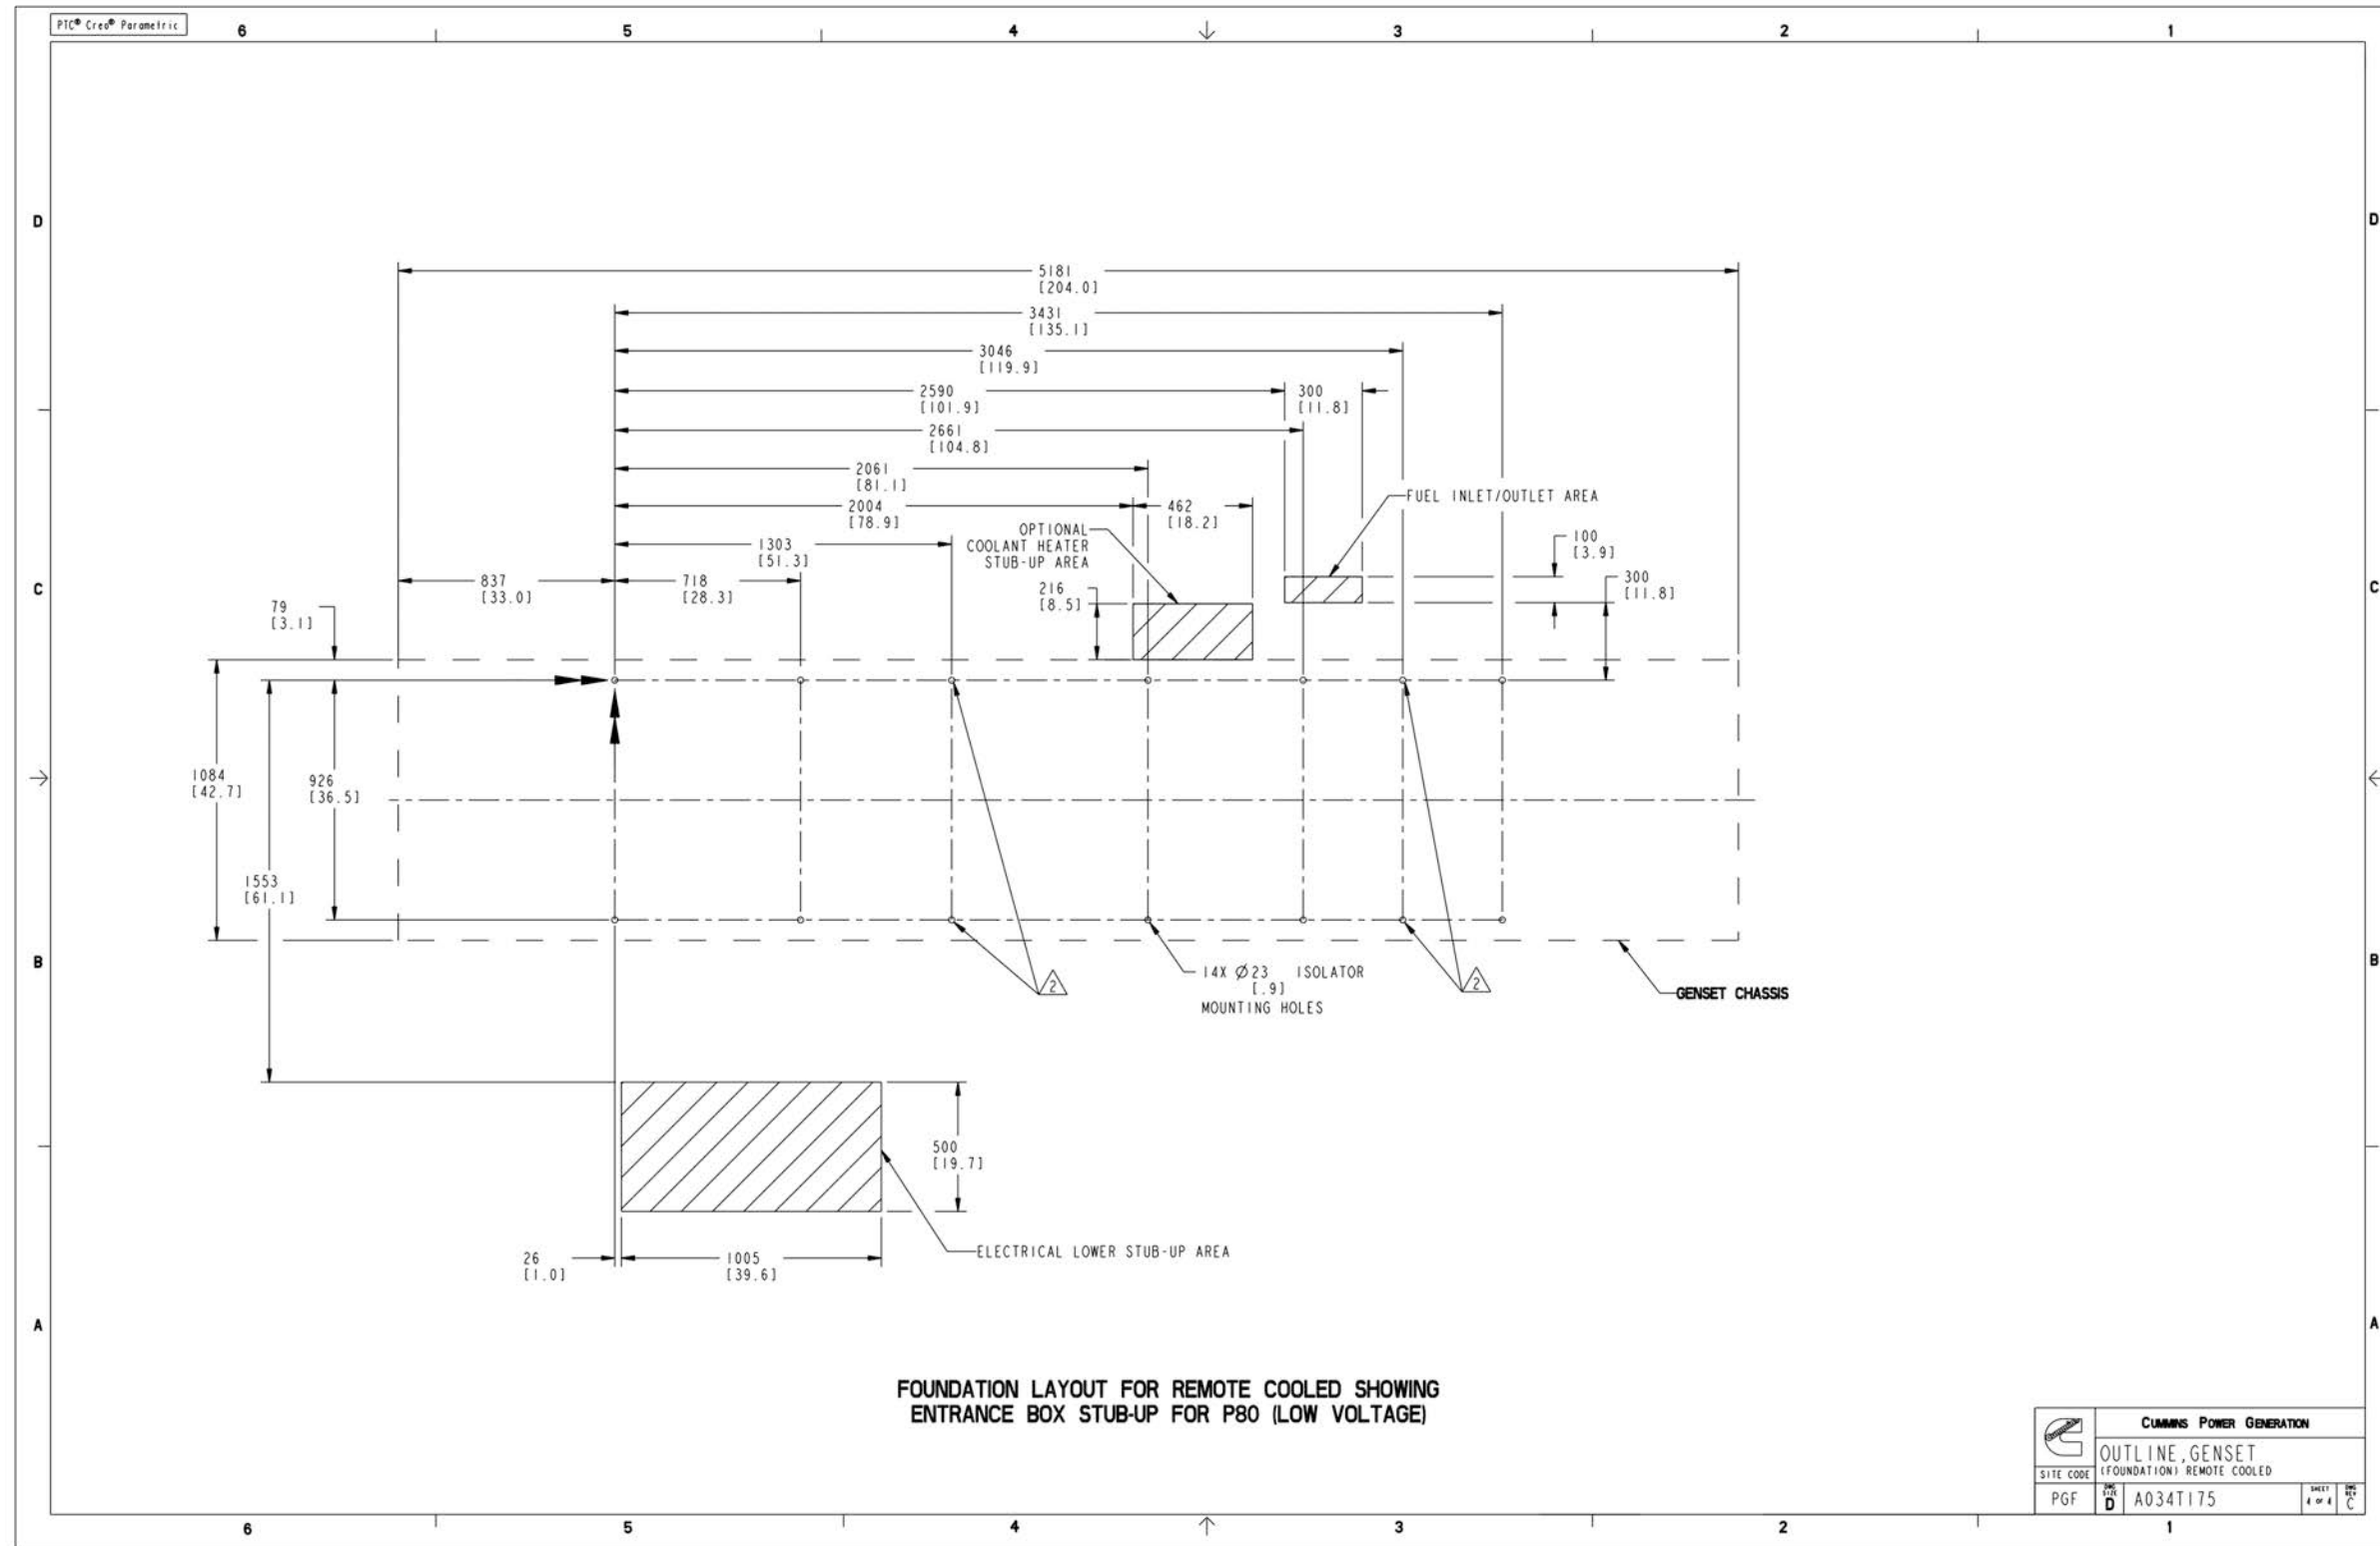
FOUNDATION DRAWING FOR REMOTE COOLED GENERATOR SET (SHEET 4)
